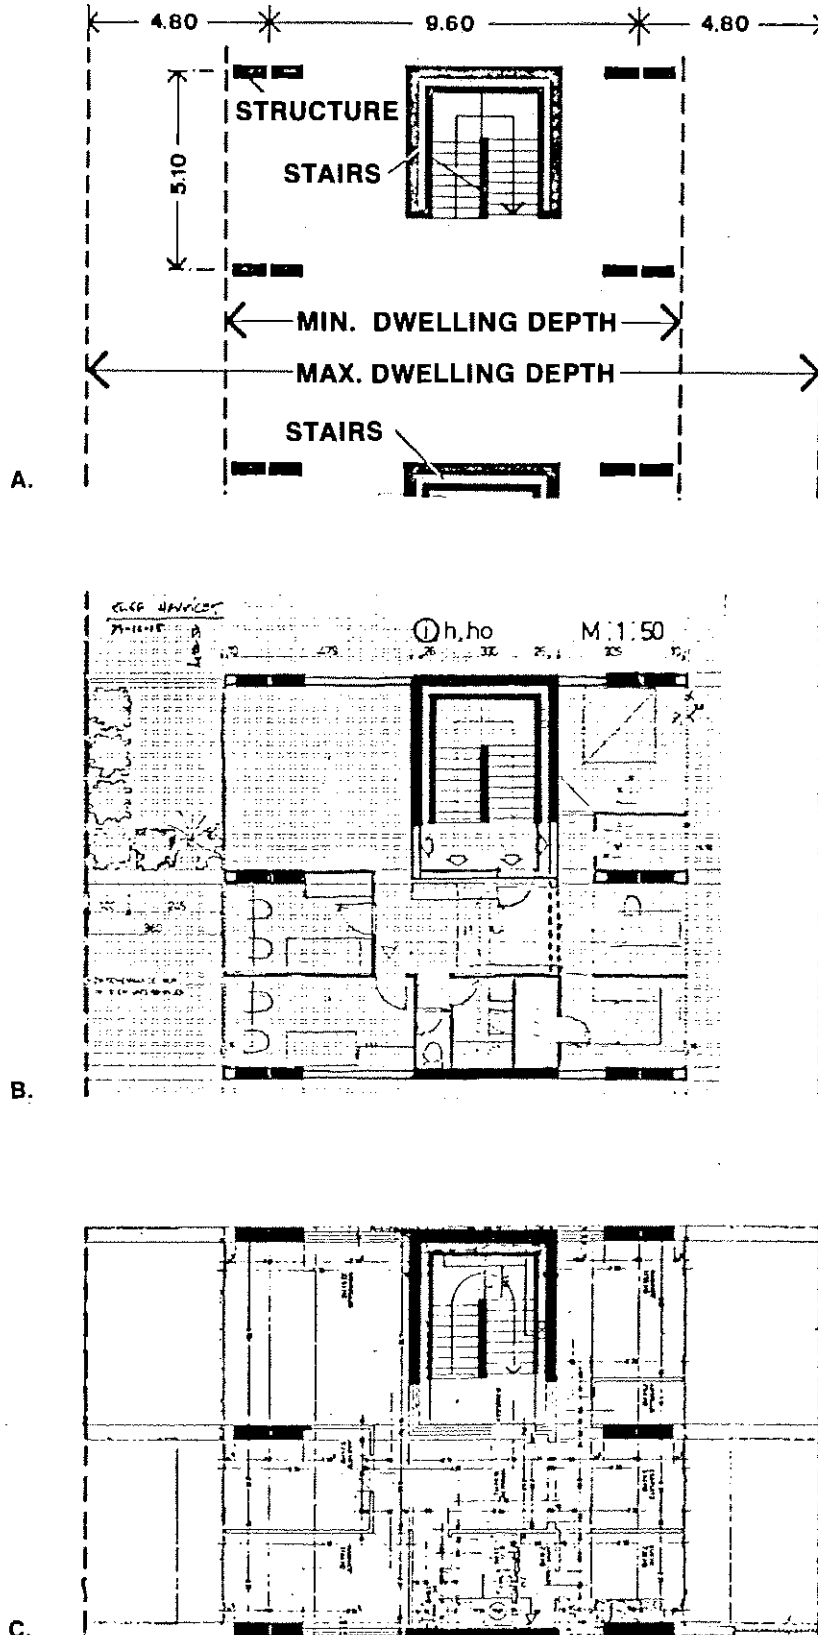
a: Zones and primary support elements; b: floor plan developed by user during meeting; c: same floor plan "adjusted" by architect for construction purposes.
